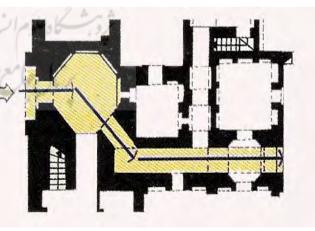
Hashti and Daloon (source: Haeri, 2009)
